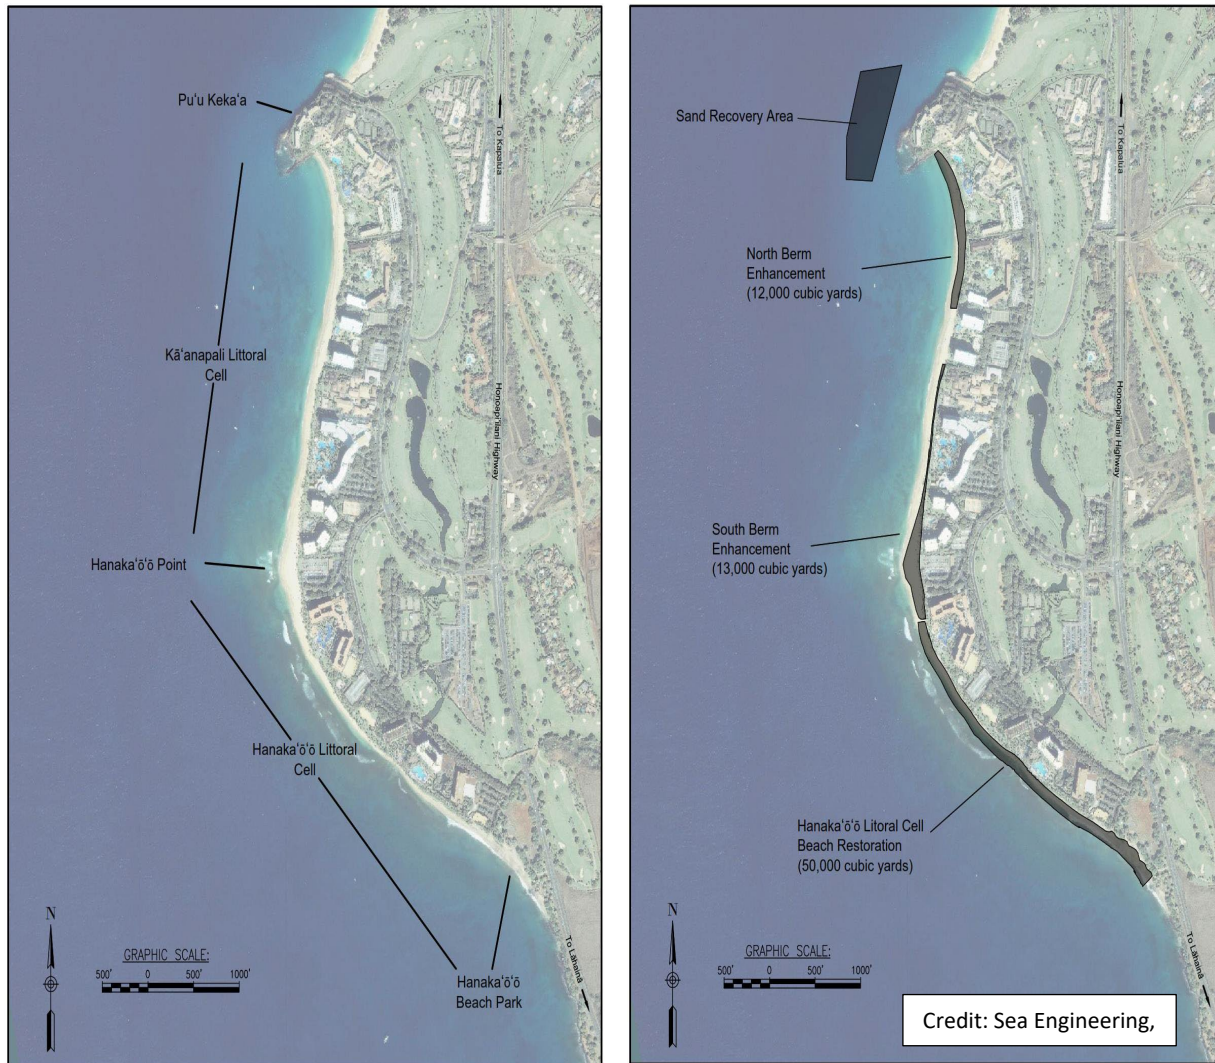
Proposed beach restoration and berm enhancement at Kā'anapali, Maui
